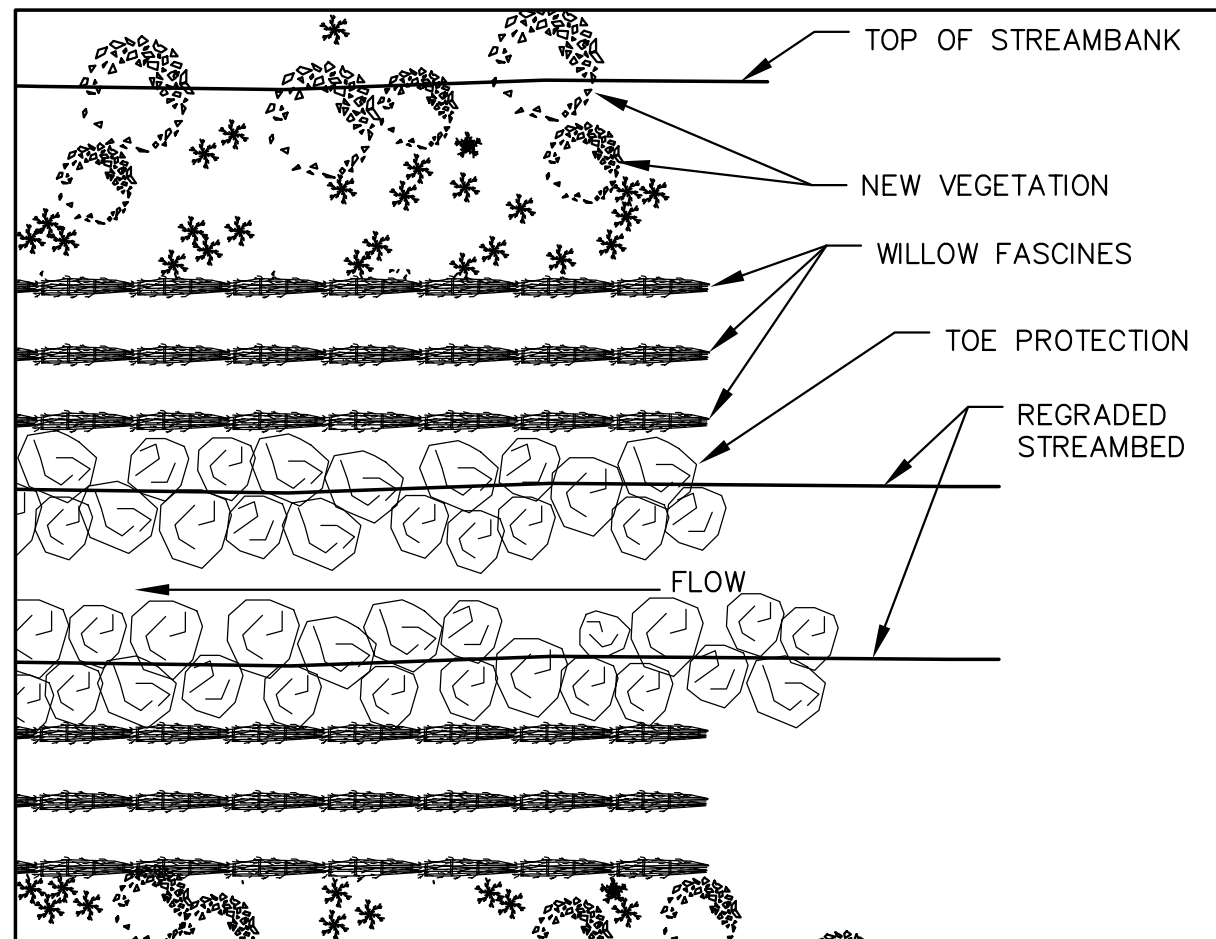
EXISTING AND PROPOSED SITE PLAN
